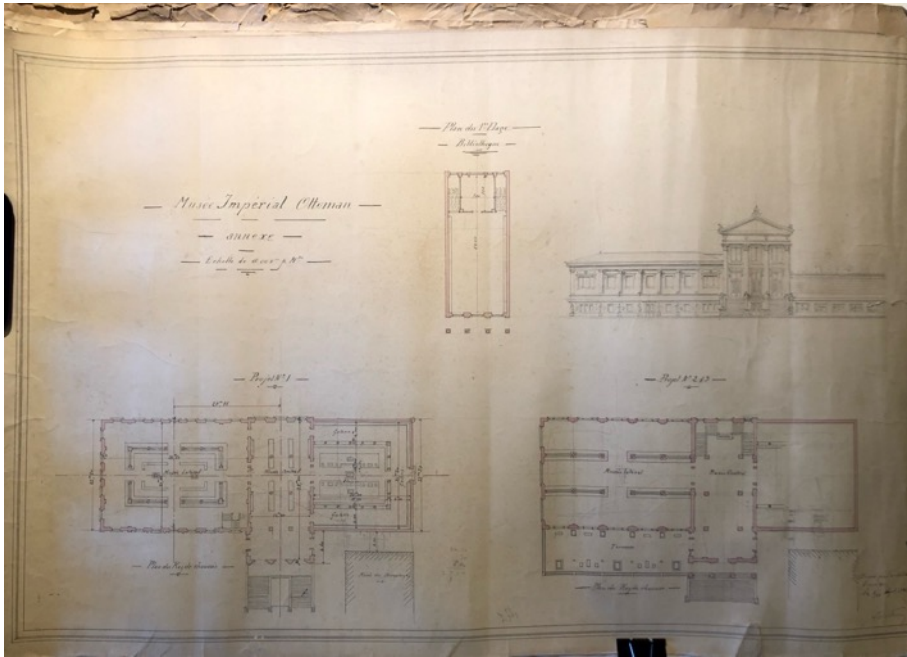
The alternative plan and elevation drawings signed by Alexandre Vallauray dated to 1899 (source: “IAM Archive, 56, G2/R4/24”)
